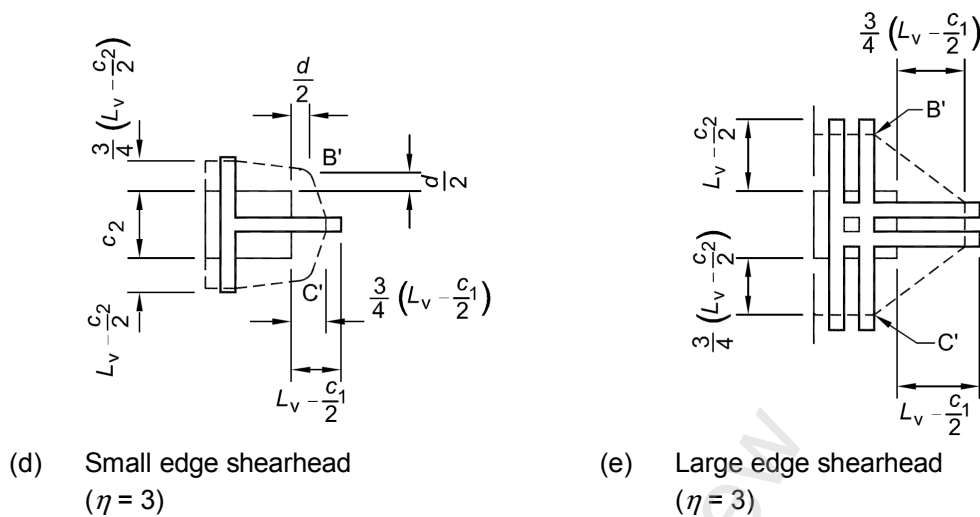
Location of critical section defined in 12.7.5.3 (continued)
